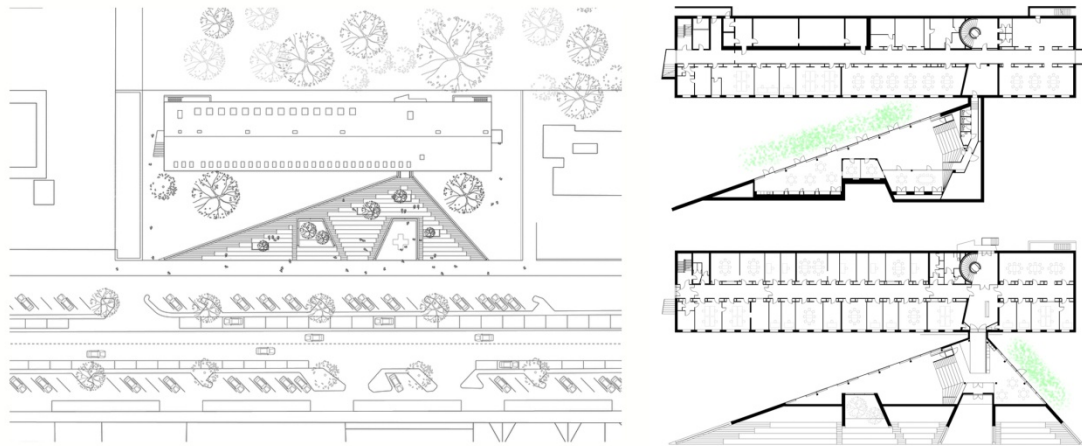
Red Cross Volunteer House. Site plan and floor plans. The floor plans show the connection to the green areas at the sides of the buildings at different levels [drawings by COBE; found at (Barandy, 2018)].
